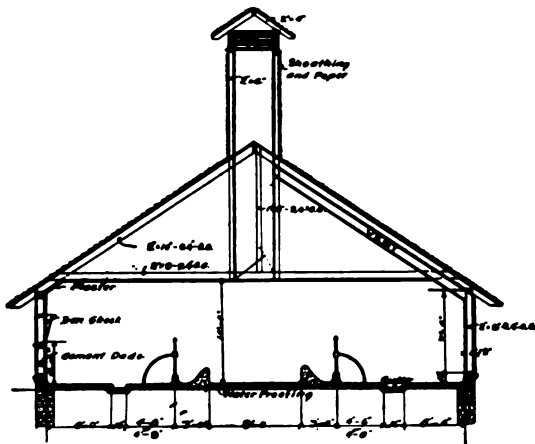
Vertical section of cow barn. The arrangement of the floor space is liberal and facilitates the work.
